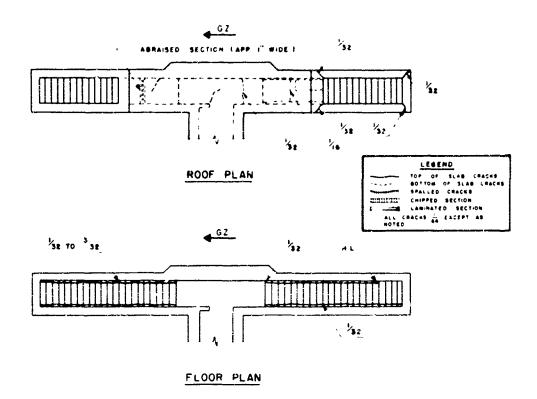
Blast damage to surface section of entrance facing away from GZ.
